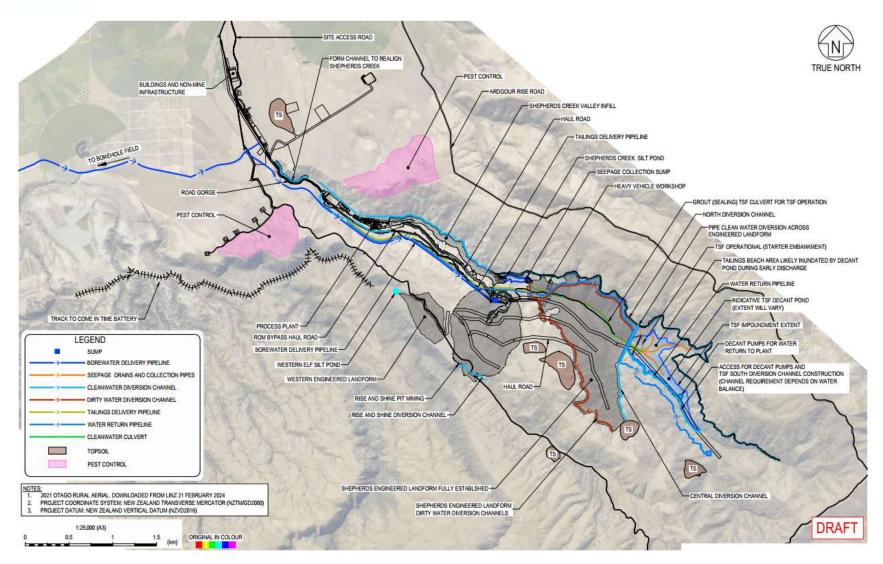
RAS Pit Mining, Month 25 – 54 activities: Surface mining producing and feeding processing, Underground development in months 48 – 54, without ore.
